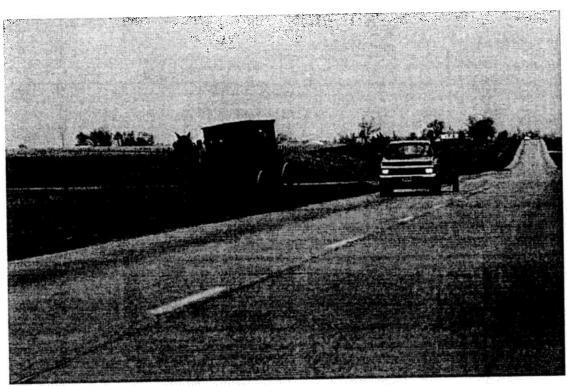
Transition from road to shoulder, Davis County, Iowa
